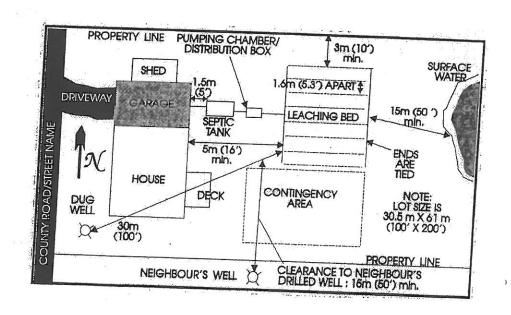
TYPICAL SITE PLAN DRAWING
